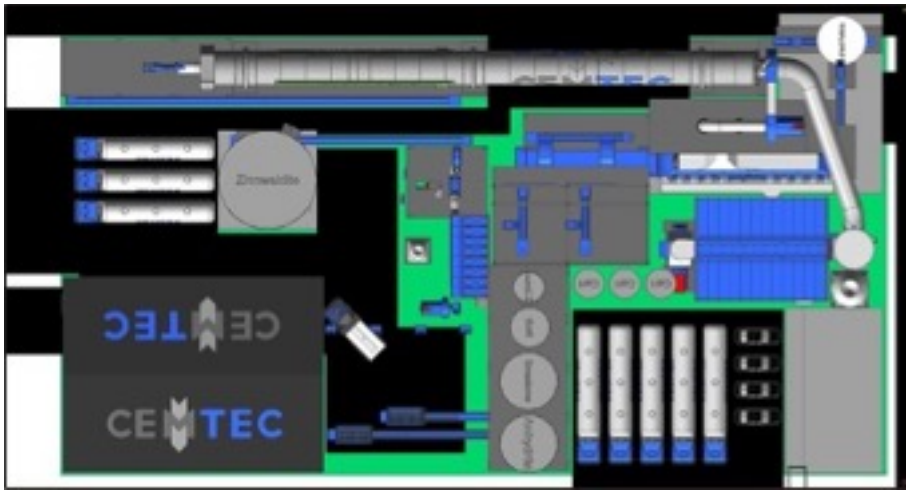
Layout of the roasting plant (View North to South with open buildings)
